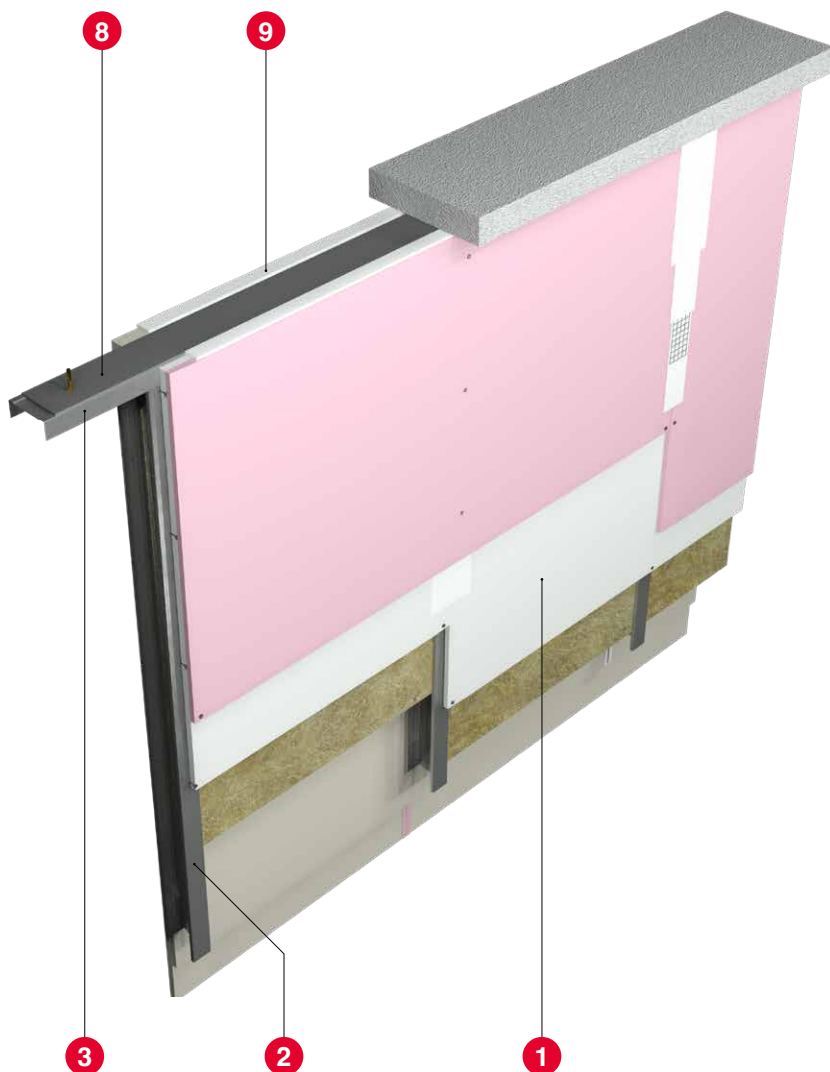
Connecting a partition wall with a ceiling, with ceiling deflection up to 5 cm
